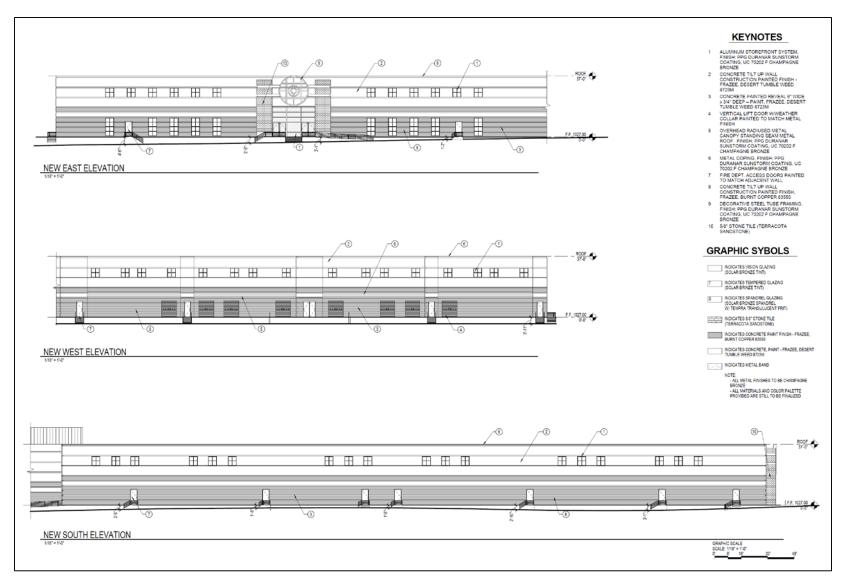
EXTERIOR ELEVATIONS—PROPOSED BUILDING
